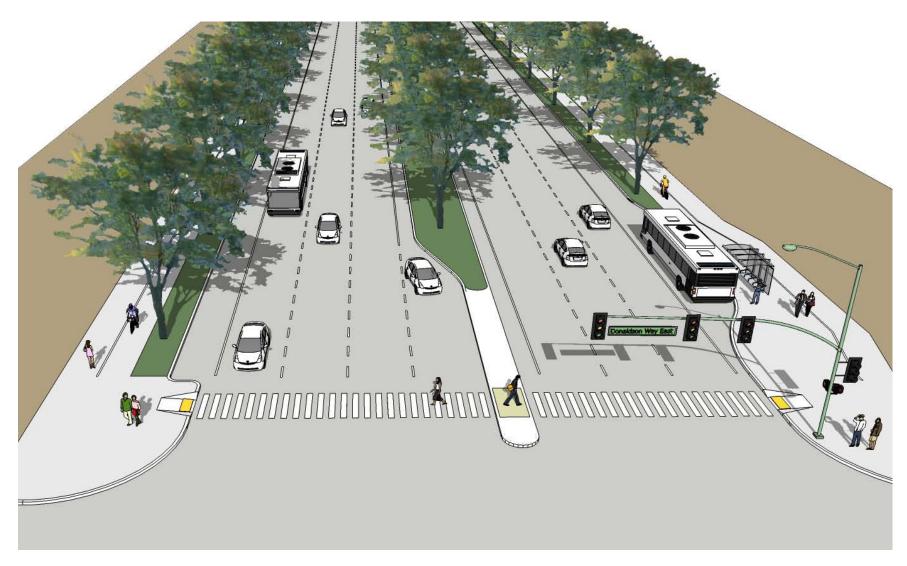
Existing and Proposed Conditions - Section 3 Modified Boulevard Concept
